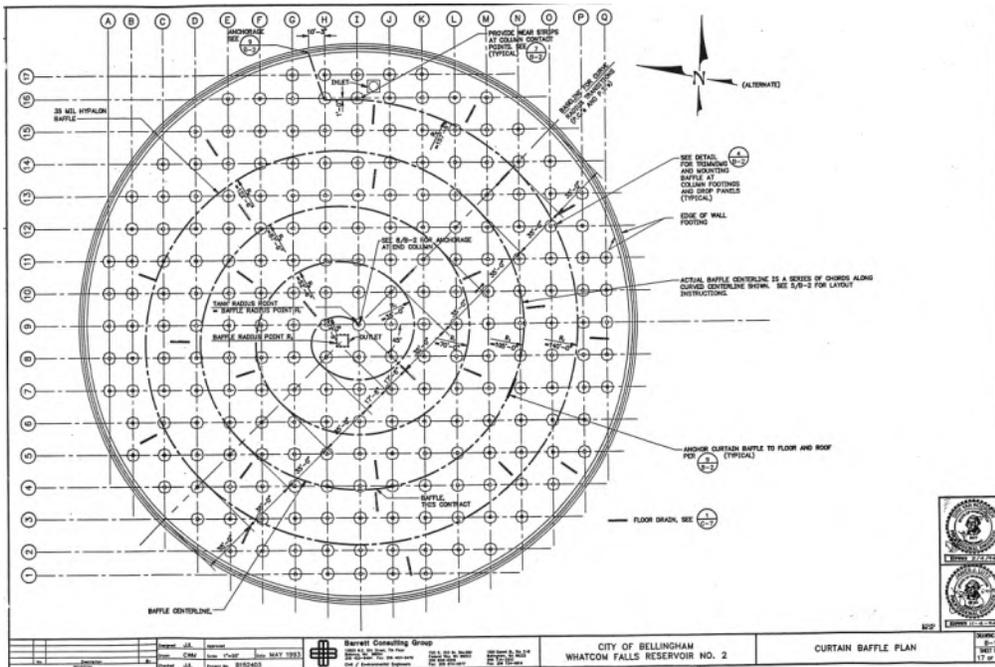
Whatcom Falls 2 – Baffle Layout Plan
